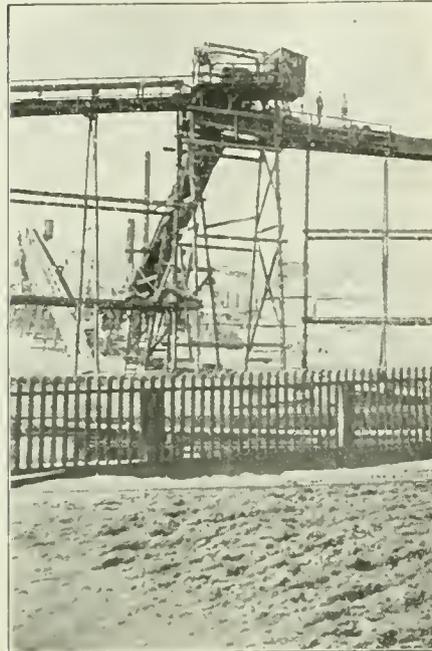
DISTRIBUTING TOWER AT SHENANDOAH CITY COLLIERY
